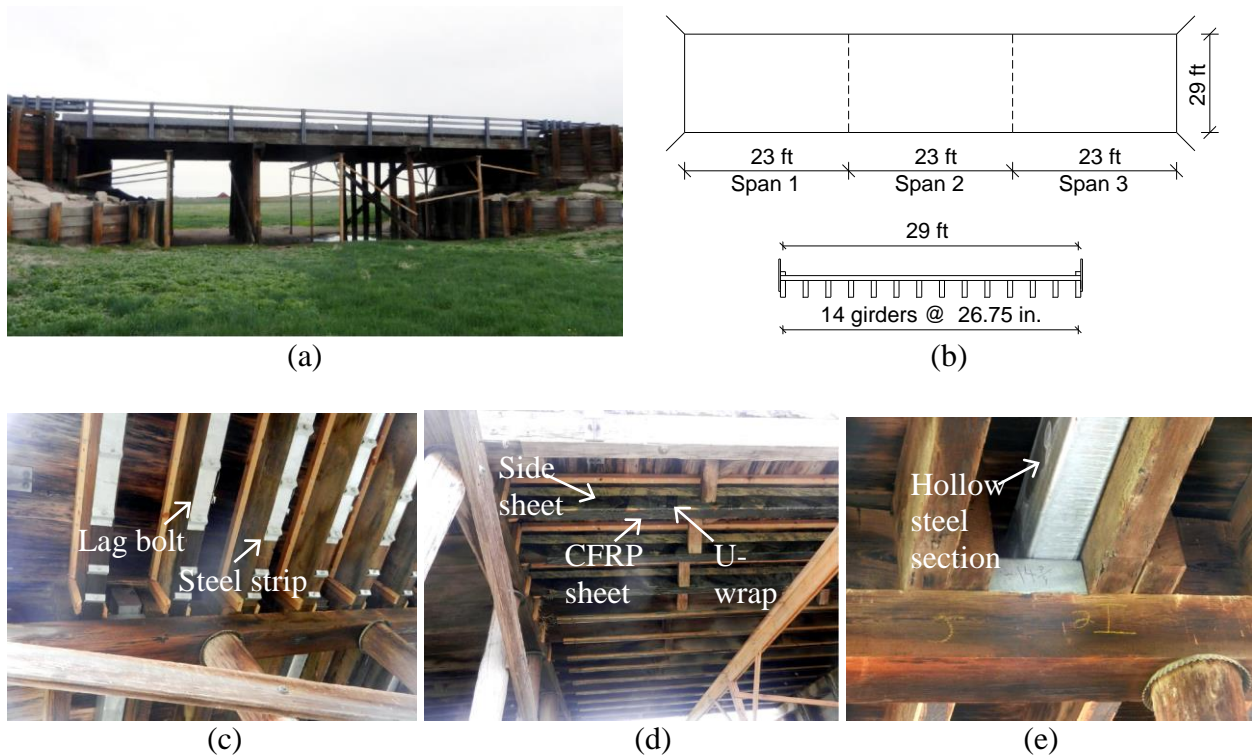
F-22-V Bridge: (a) overview; (b) dimensions; (c) retrofit with lag bolts; (d) retrofit with CFRP sheets; (e) retrofit with hollow steel section
